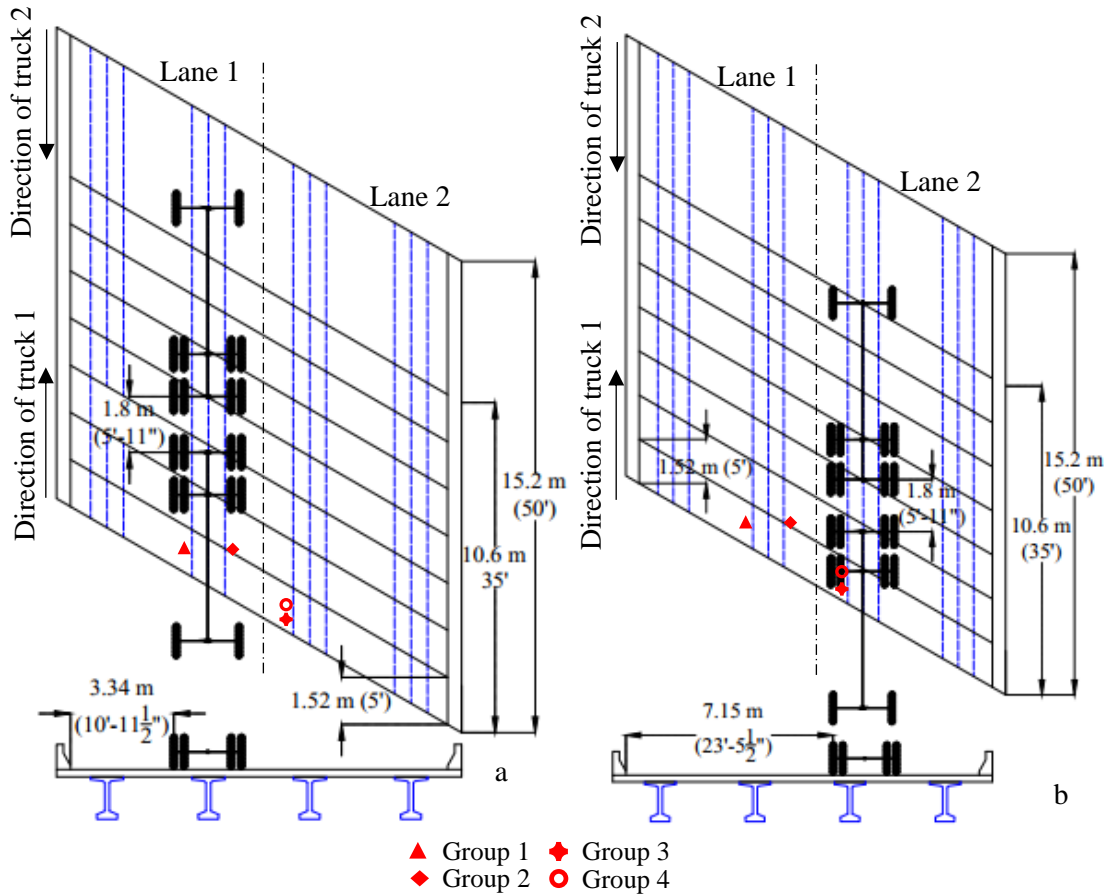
Two trucks back to back, a) on girder two, b) on girder three
